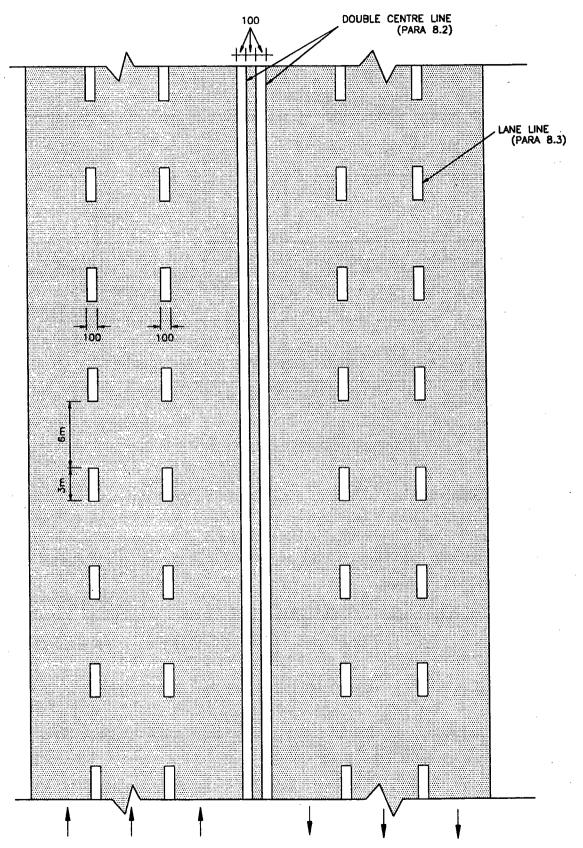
Lane Lines on a Six Lane Rural Road Straight Stretch (Ref. Paras 8.2.11 & 8.3.5.)
